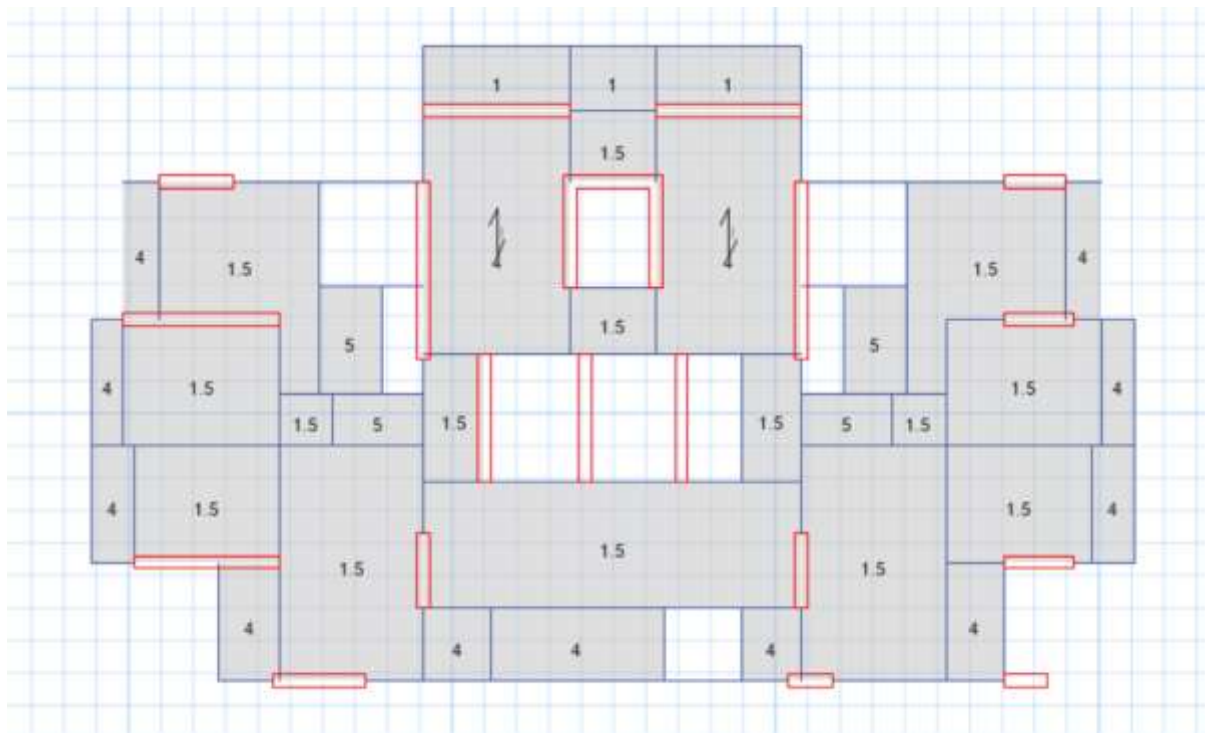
SDL (Floor finish and Sunk load) on typical floor
